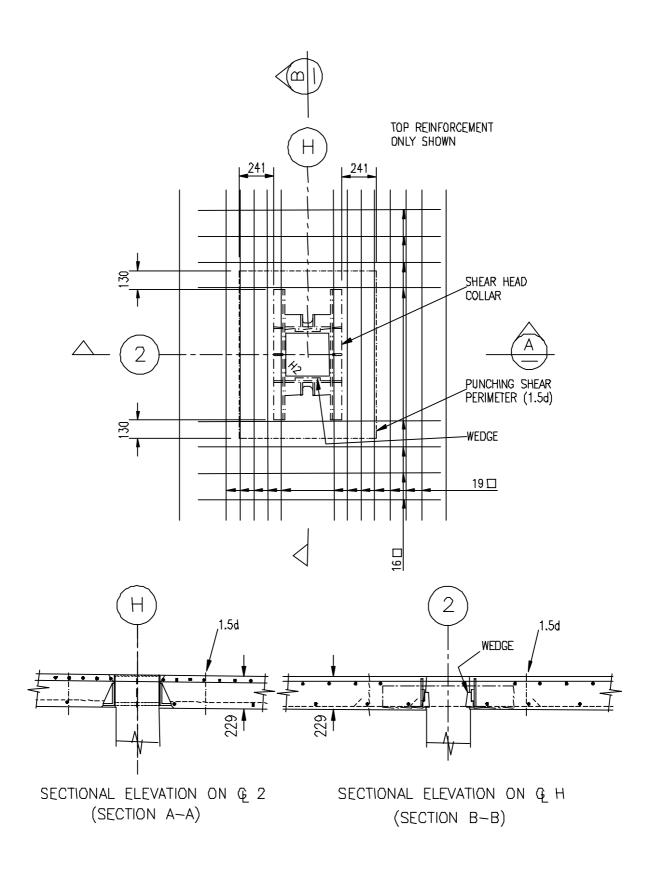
1 Reinforcement and shear head 'collar' at H2
